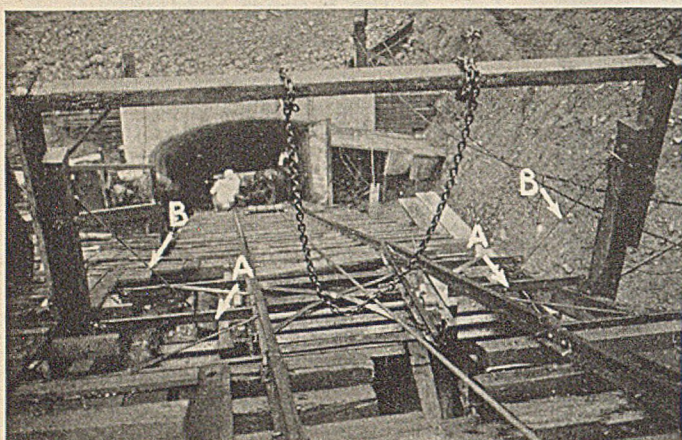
Bridge Rails Form a Crossing Over the Horn Dump
